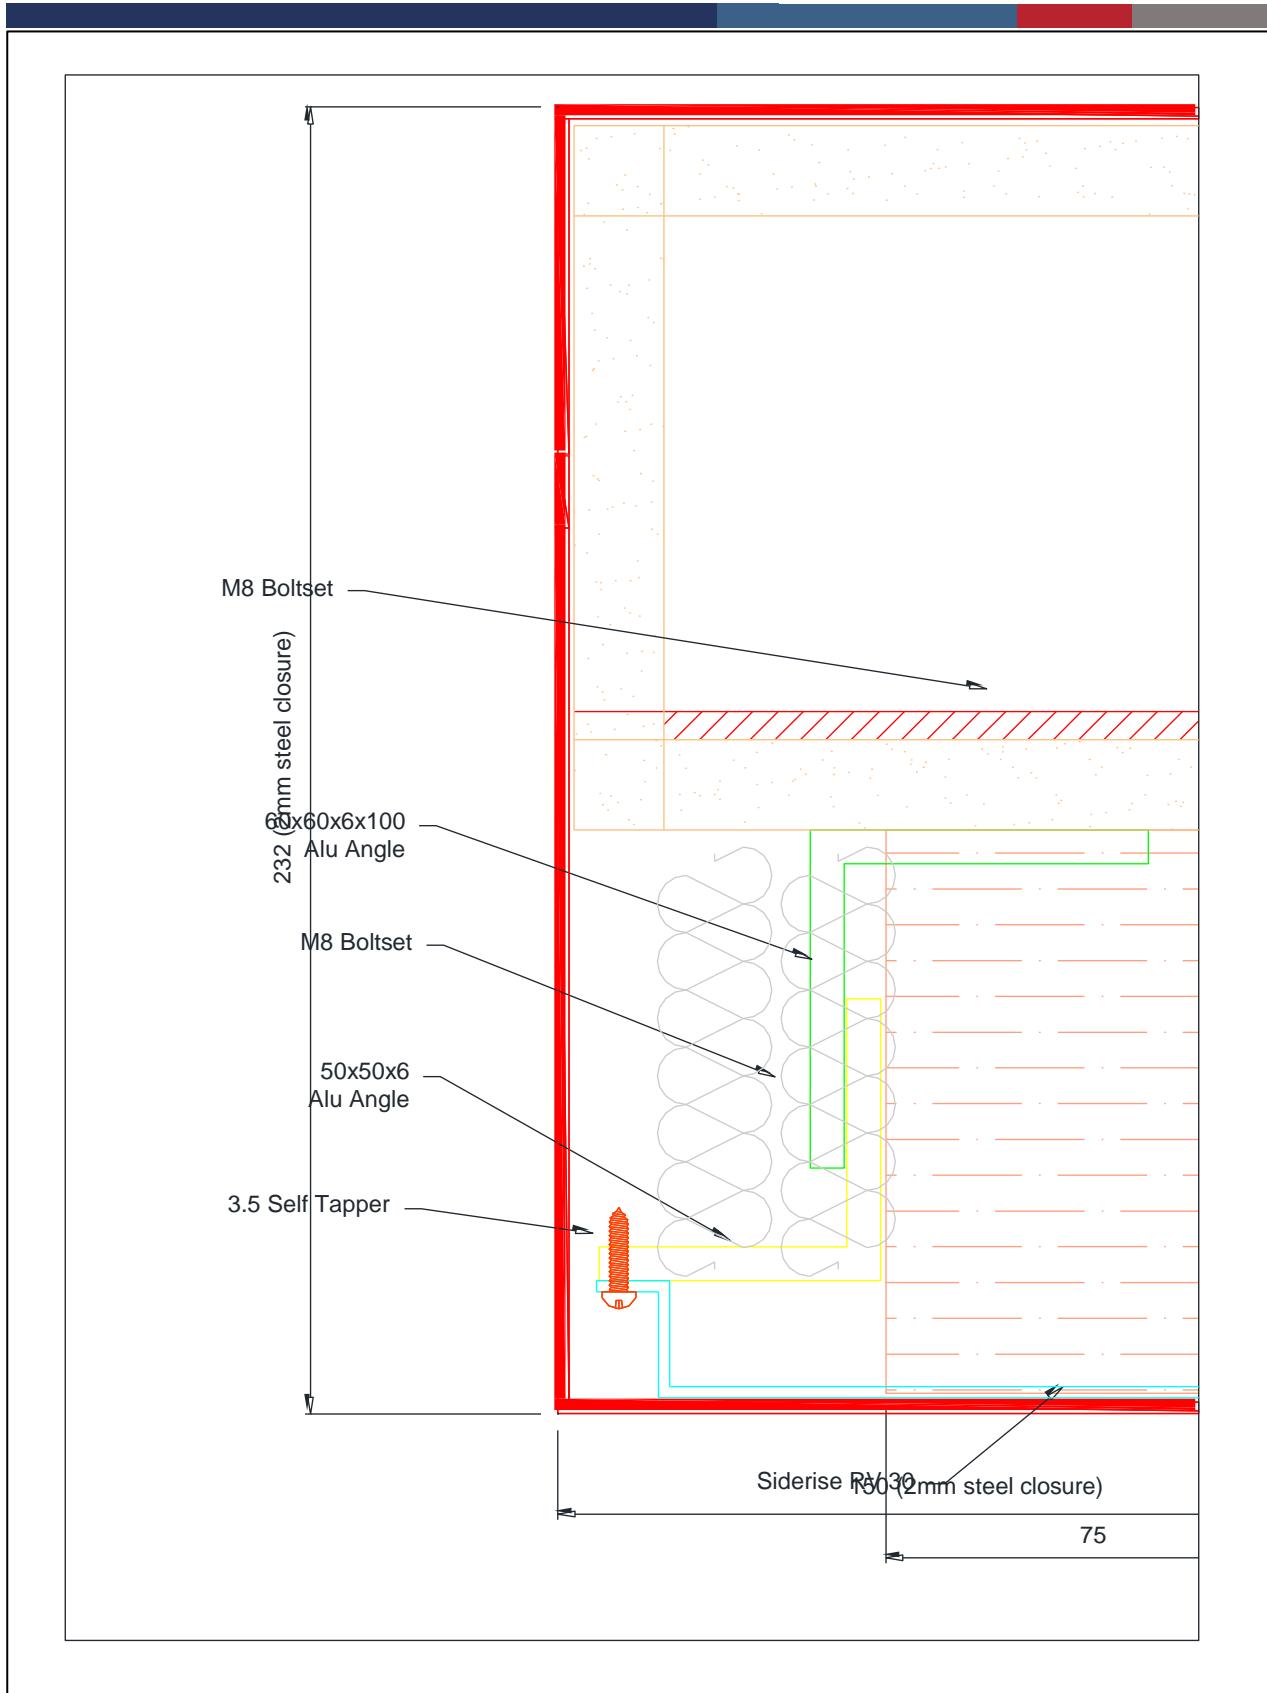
Detail D08 (Horizontal panel to panel joint) of the specimen.
